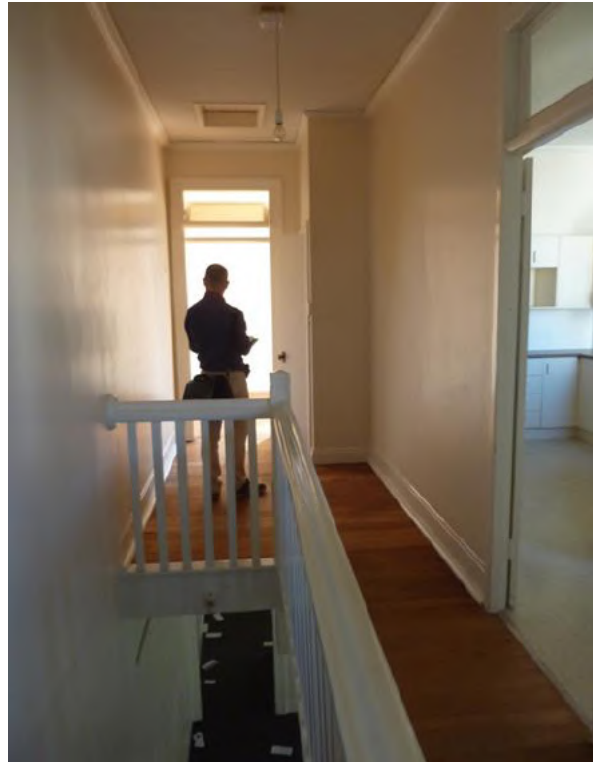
Second floor landing (space 2.1)—50A / 48–56 Gloucester Street, looking west, showing the original timber floors and modern built in cupboard at end of hall adjacent to bedroom (space 2.4). (Source: GML Heritage, July 2016)
